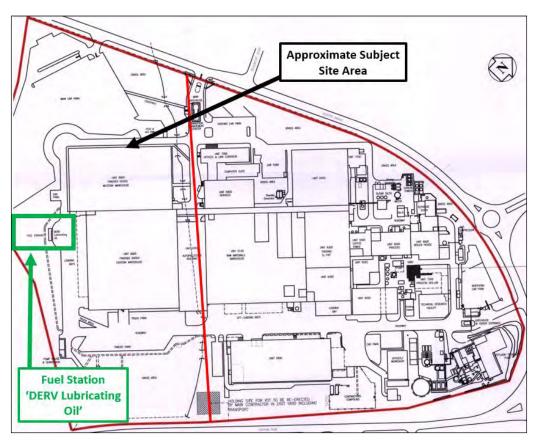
Former Subject (and adjacent larger Kraft) Site Layout
